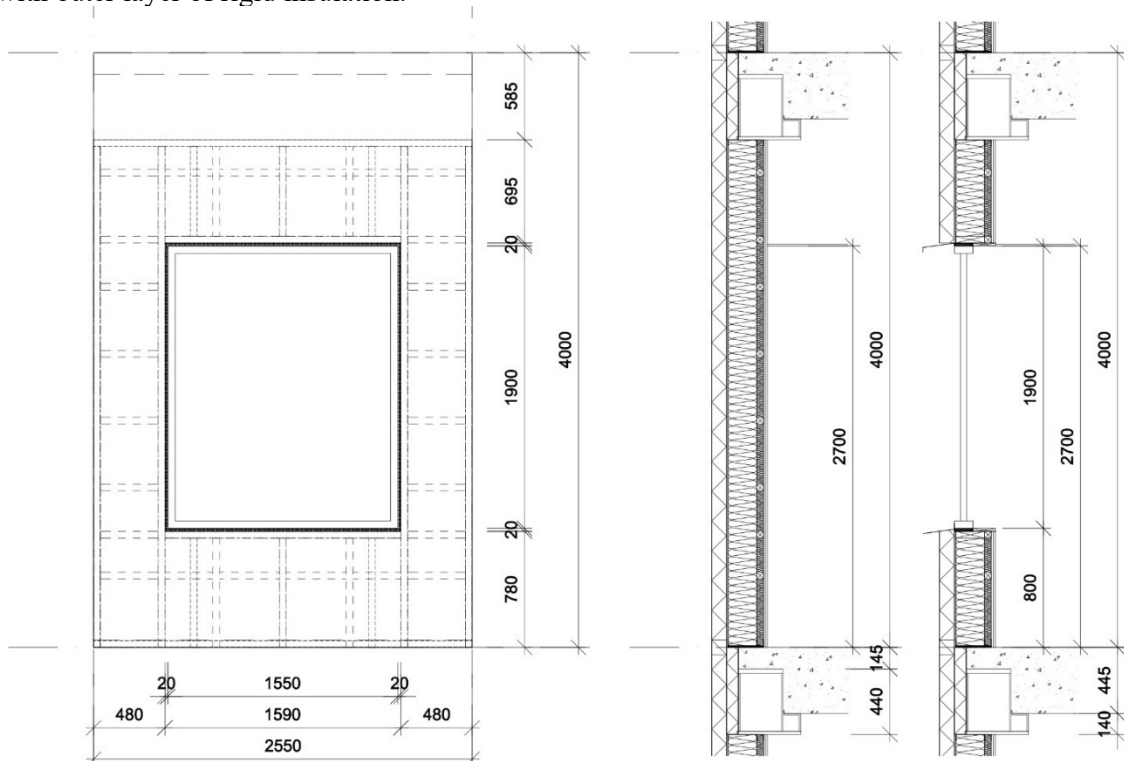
The elevation (left) and sections (right) of the wooden frame panel used in this study.
